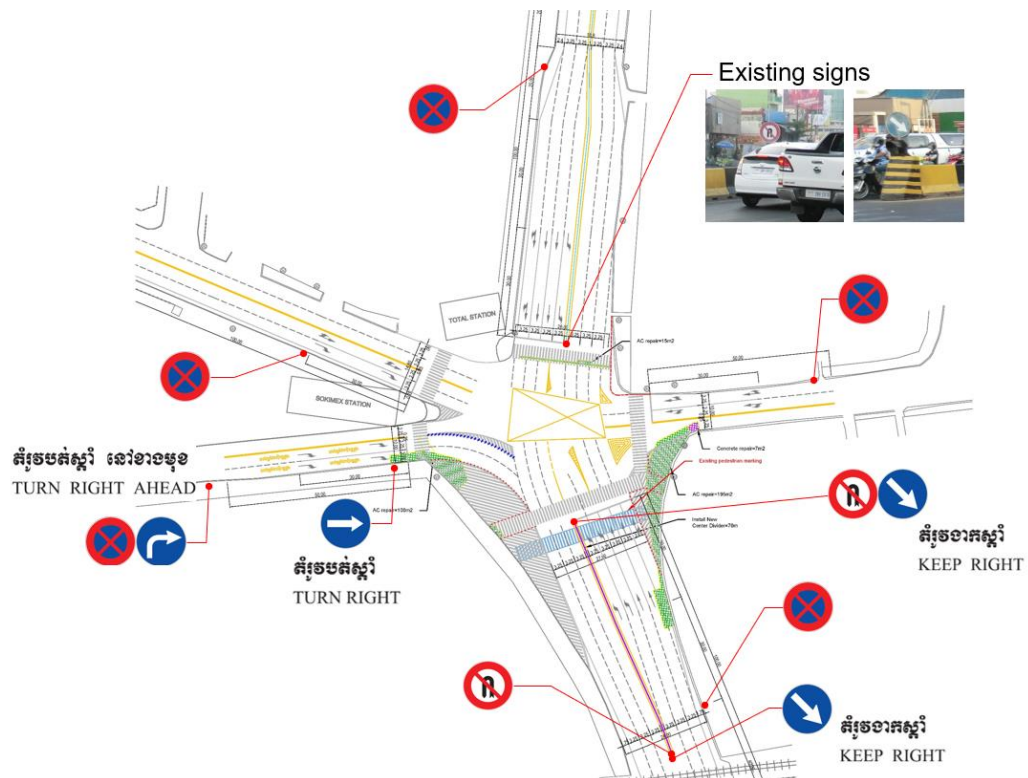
Examples of the Installation of Traffic Signs at Intersection #166
